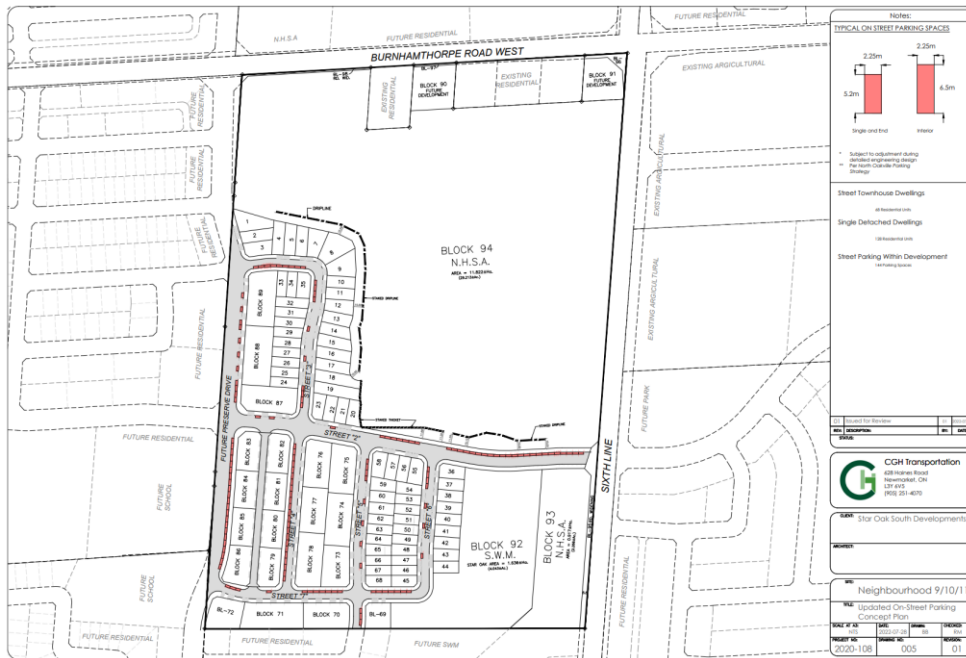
Conceptual On Street parking in relation to proposed driveways
